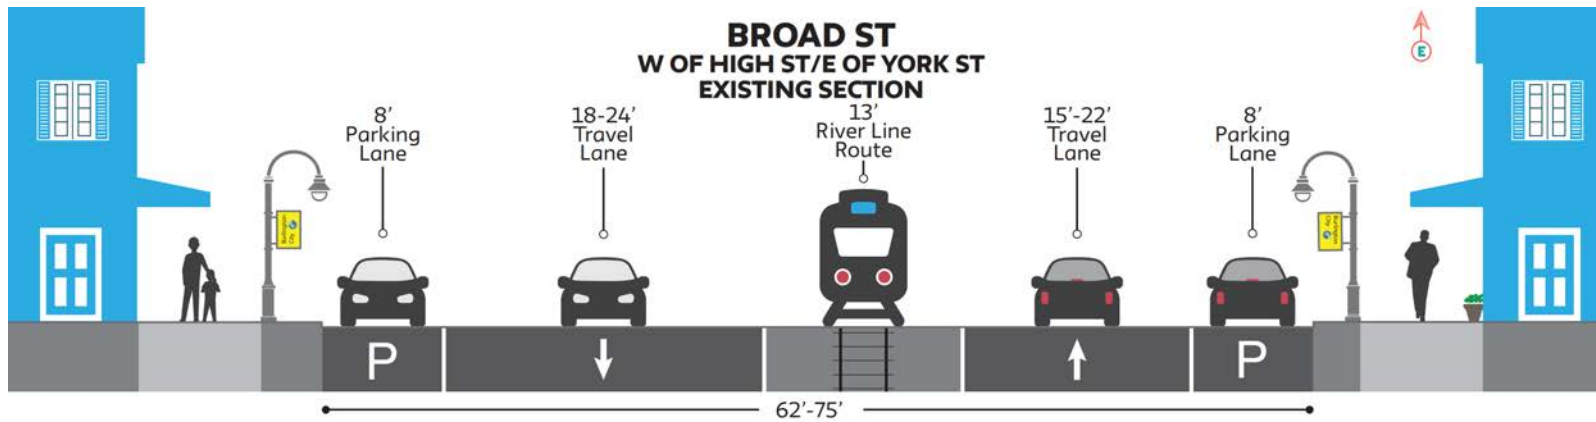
Existing Cross Section Broad Street - West of High Street/East of York Street
